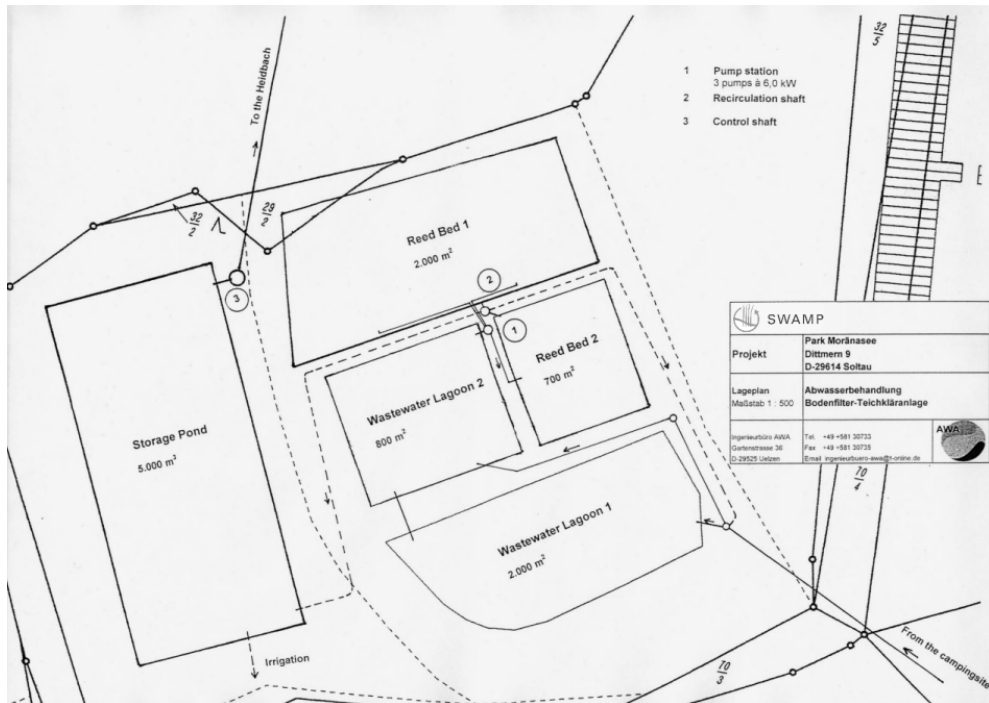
General layout of Park Moränasee treatment plant (source AWA)
